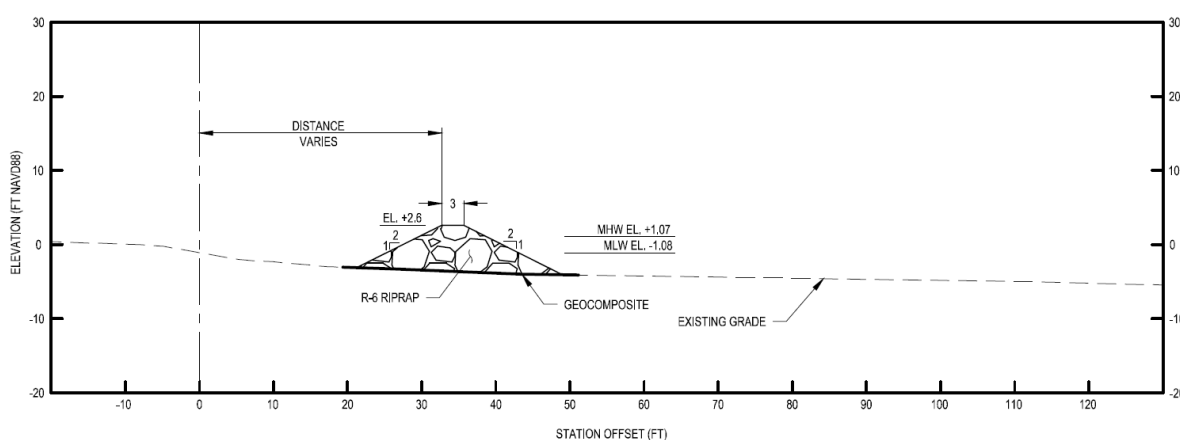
Typical Section of a Rubble Mound Breakwater at Alignment C
